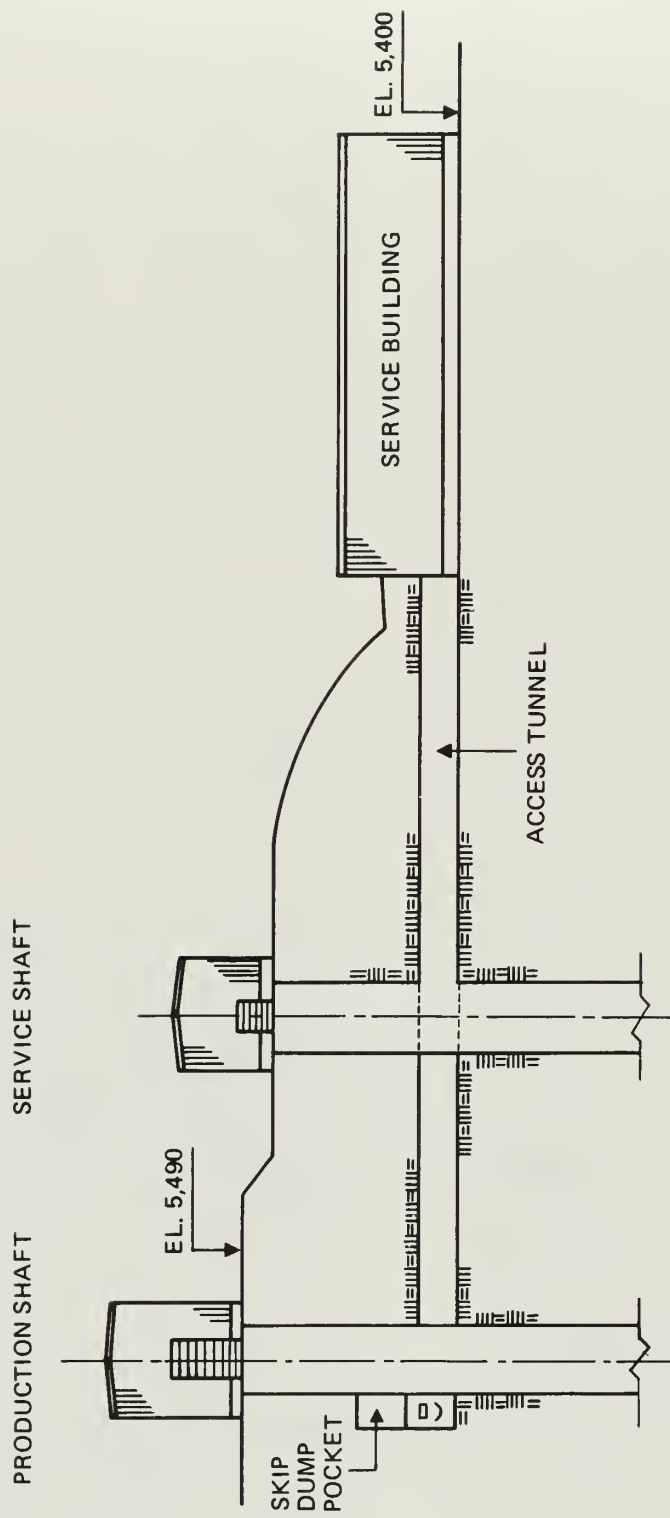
CROSS SECTION OF MINE ACCESS TUNNEL
